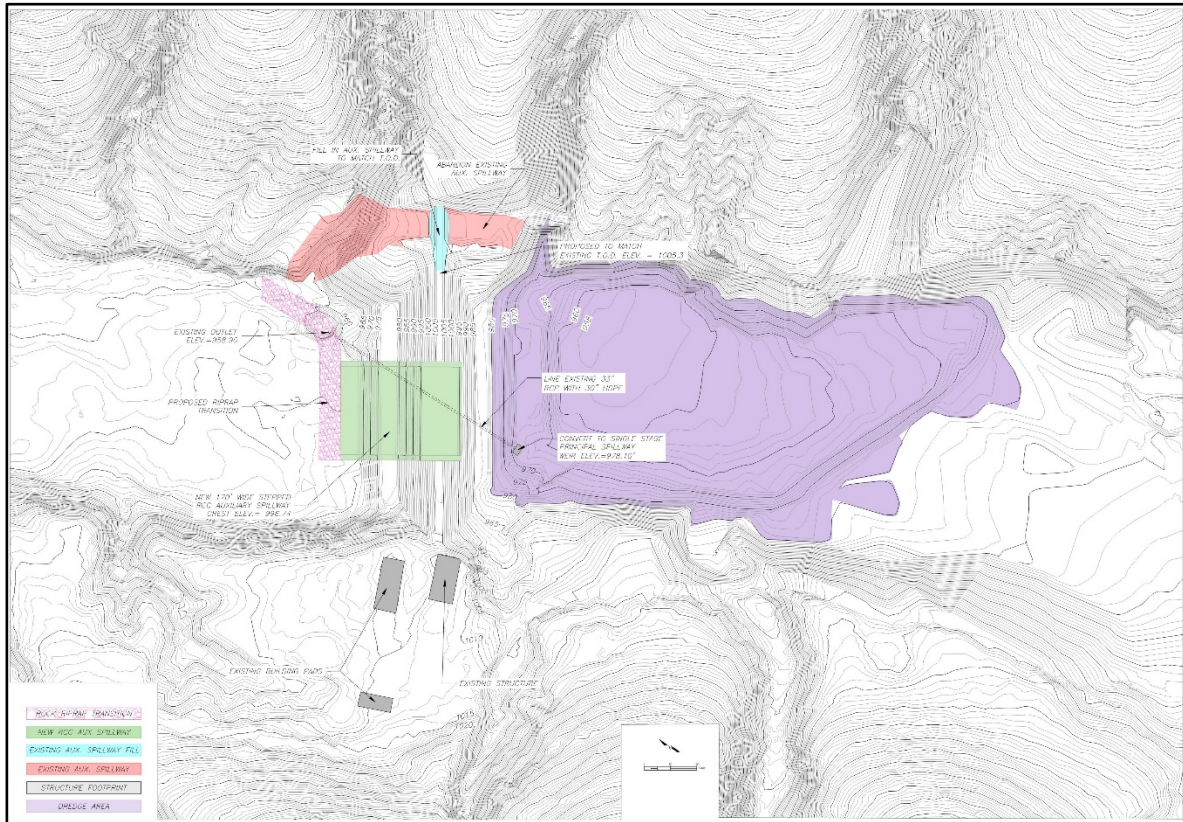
Plan view of new auxiliary spillway in Alternative 4.
